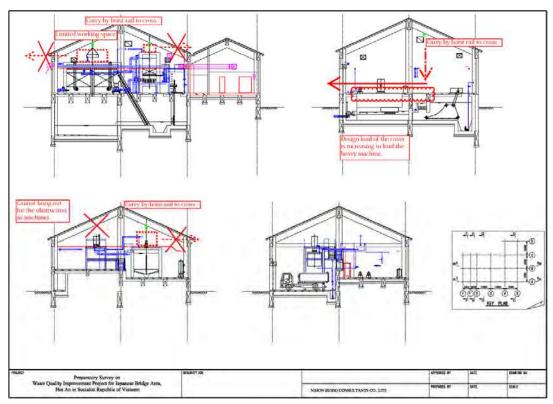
Transportation Route in the Case of Reinforced Concrete (Cross Section 2)
